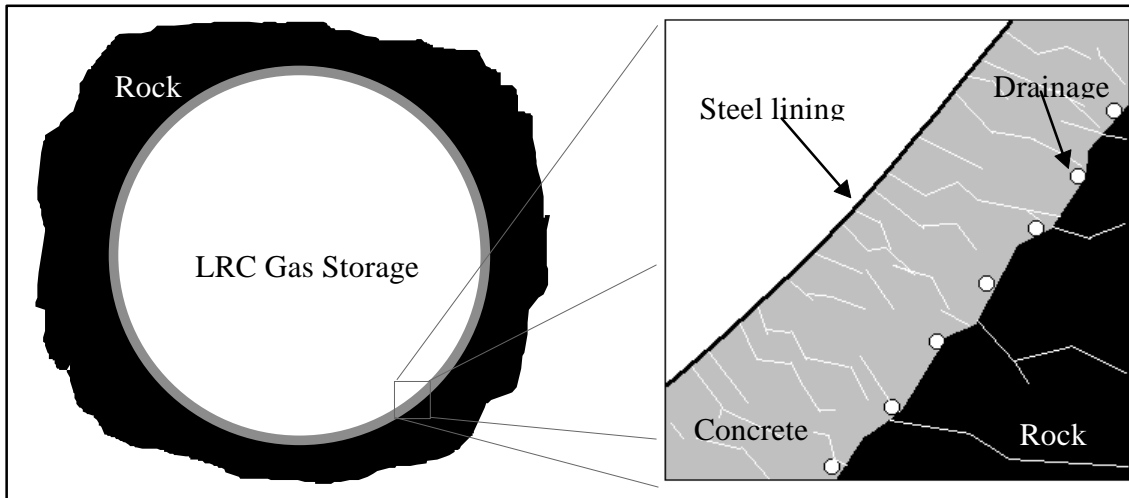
Horizontal Projection of Storage Showing the Sandwich Wall.
